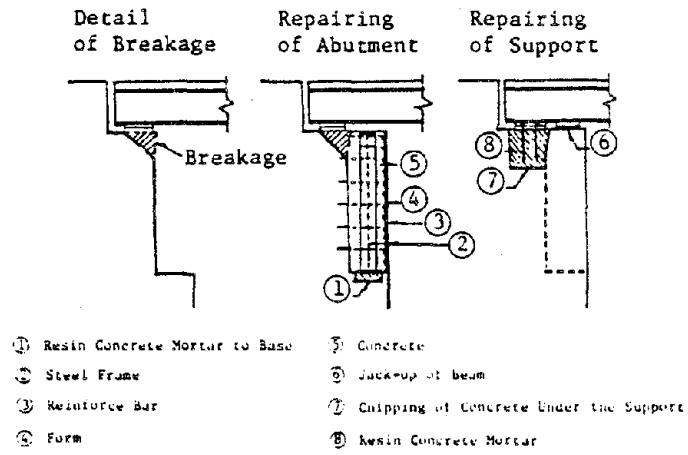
A exsample of repairing and retrofitting of support⁸⁾
